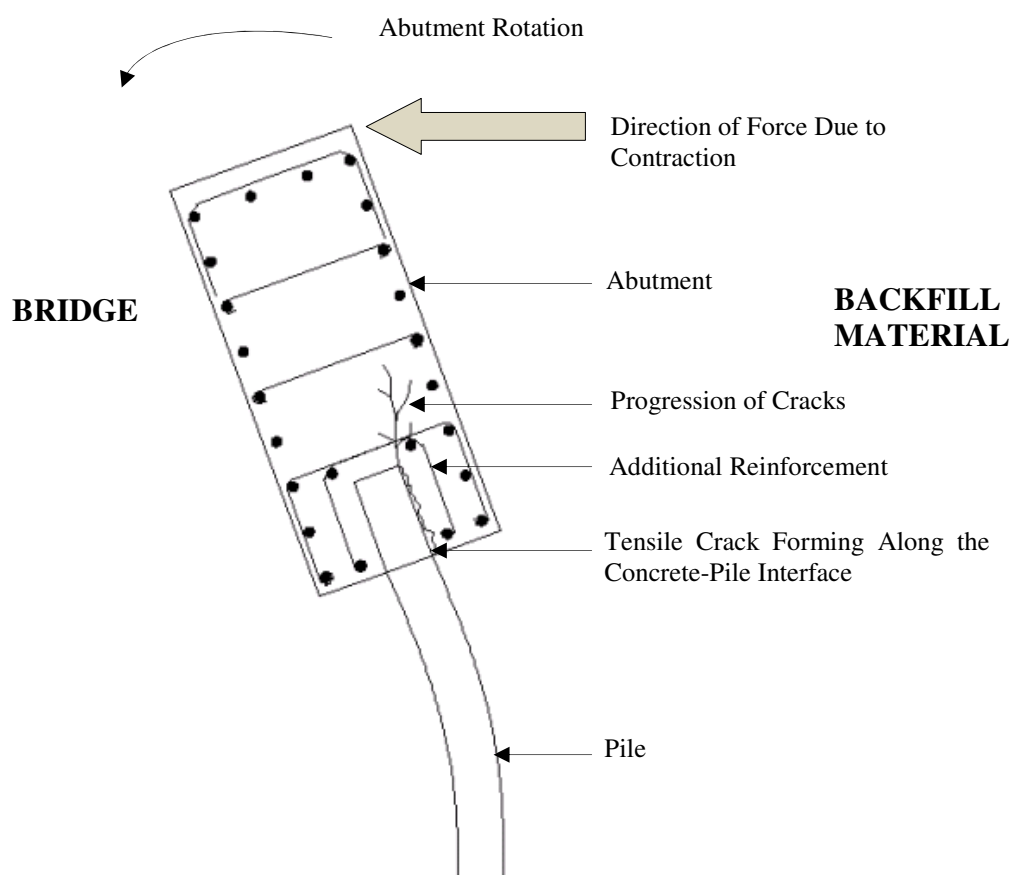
Crack Formation at the Abutment-Pile Connection
